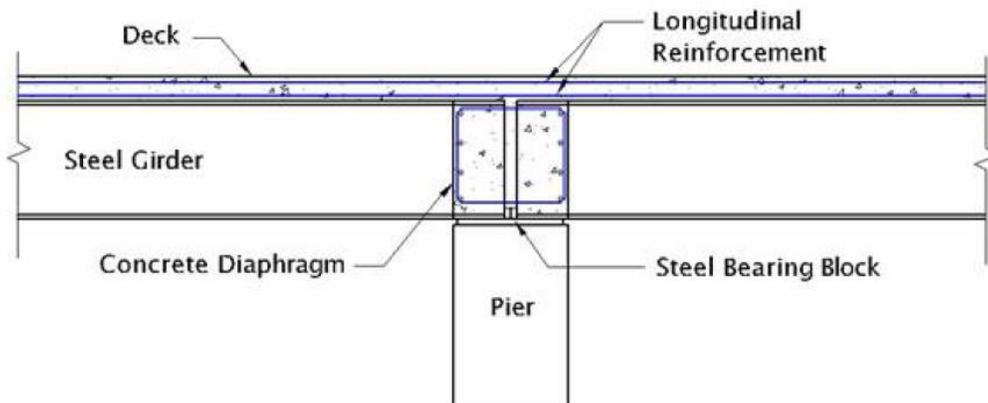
29 Simple for Dead and Continuous for Live connection detail [52].
